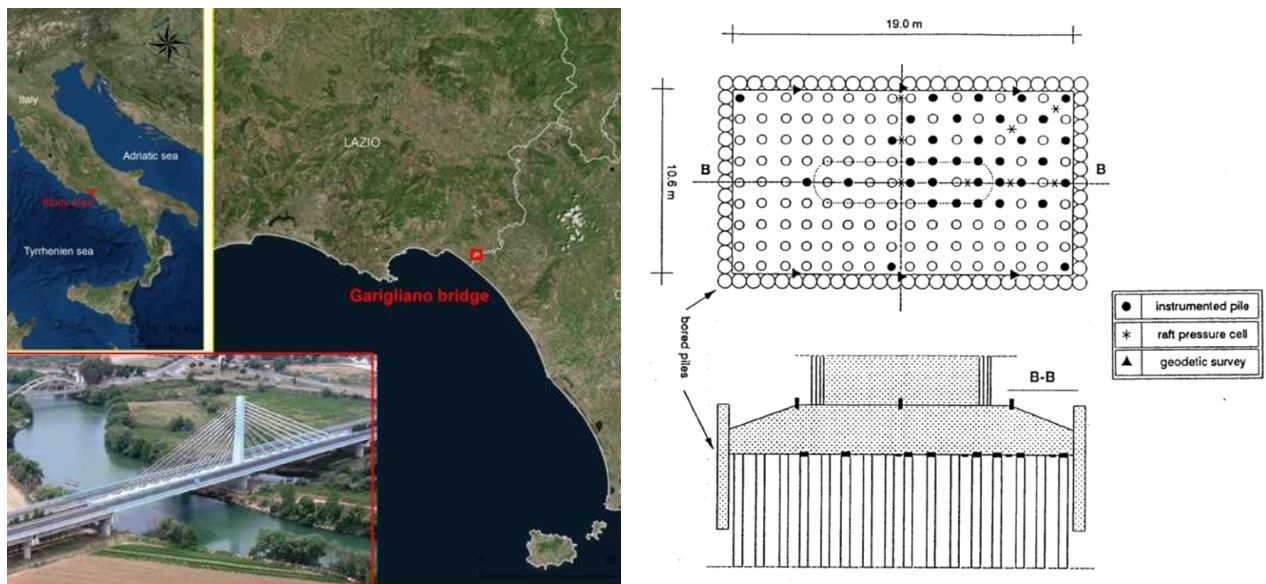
Aerial picture of the bridge and a plan view of the foundation
